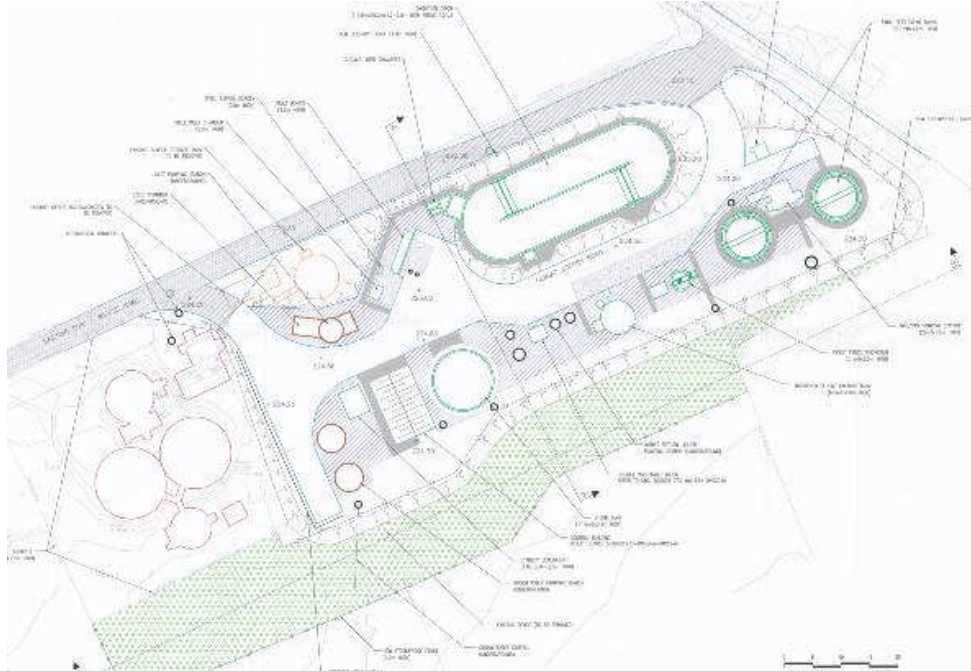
Site layout permitted under CNPA planning ref. no. 09/255/CP
